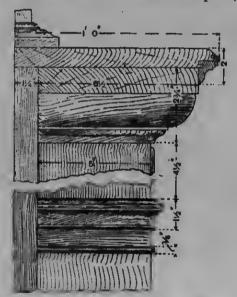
Enlarged Detail of Mantelpiece and Pilaster (eee E, Fig. 235).
